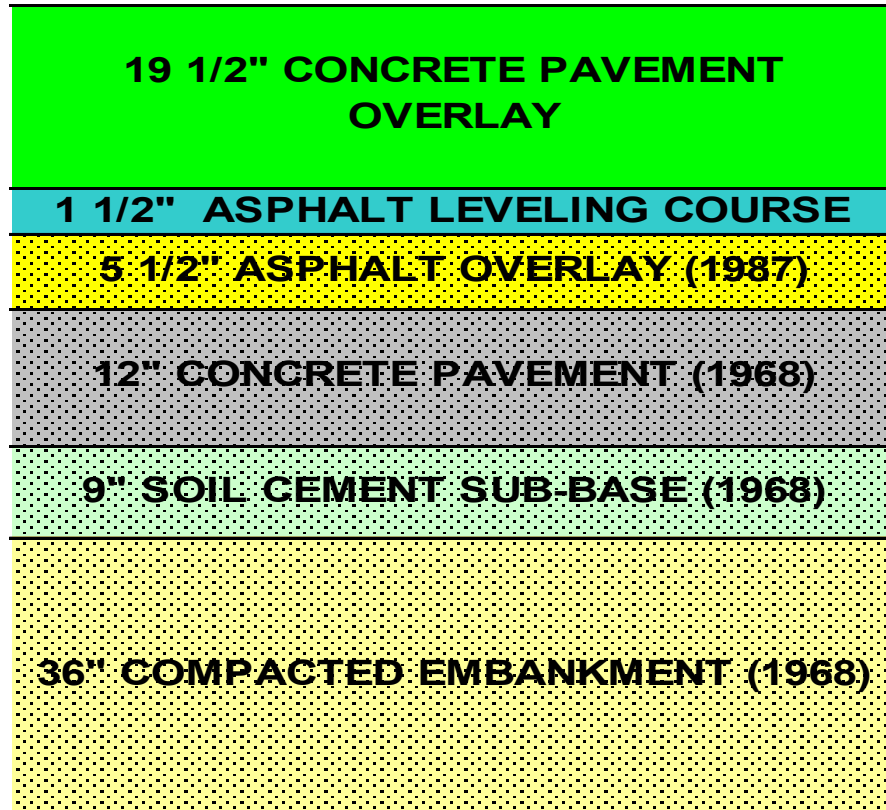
Final Pavement Cross Section for Taxiway "WP"
